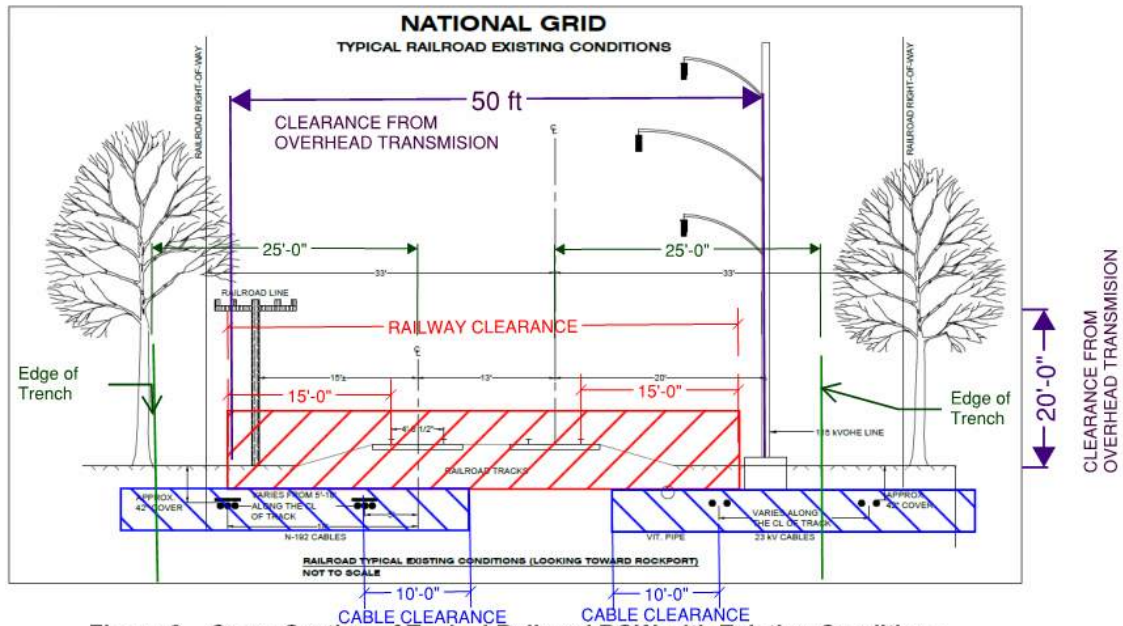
Cross Section of Typical Railroad ROW with Existing Conditions
